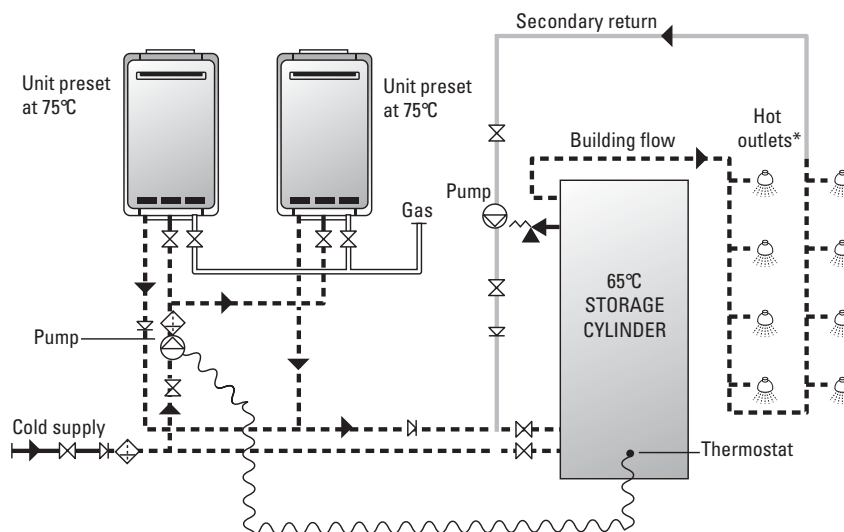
Inlet and Outlet Pipework to achieve a Balanced Storage Back up System
